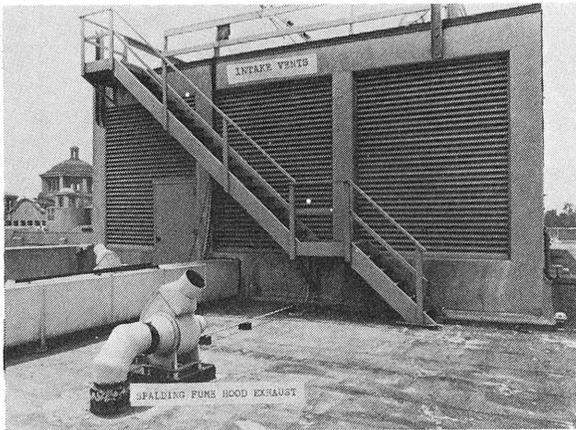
Roof of Spalding, showing the fume hood outlet from Room 236 and the main ventilation intakes
